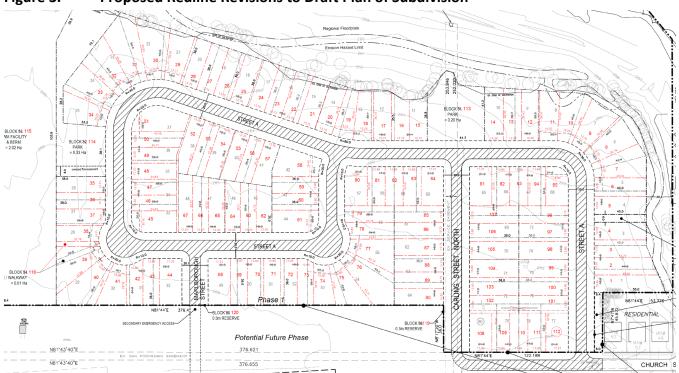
Proposed Redline Revisions to Draft Plan of Subdivision
